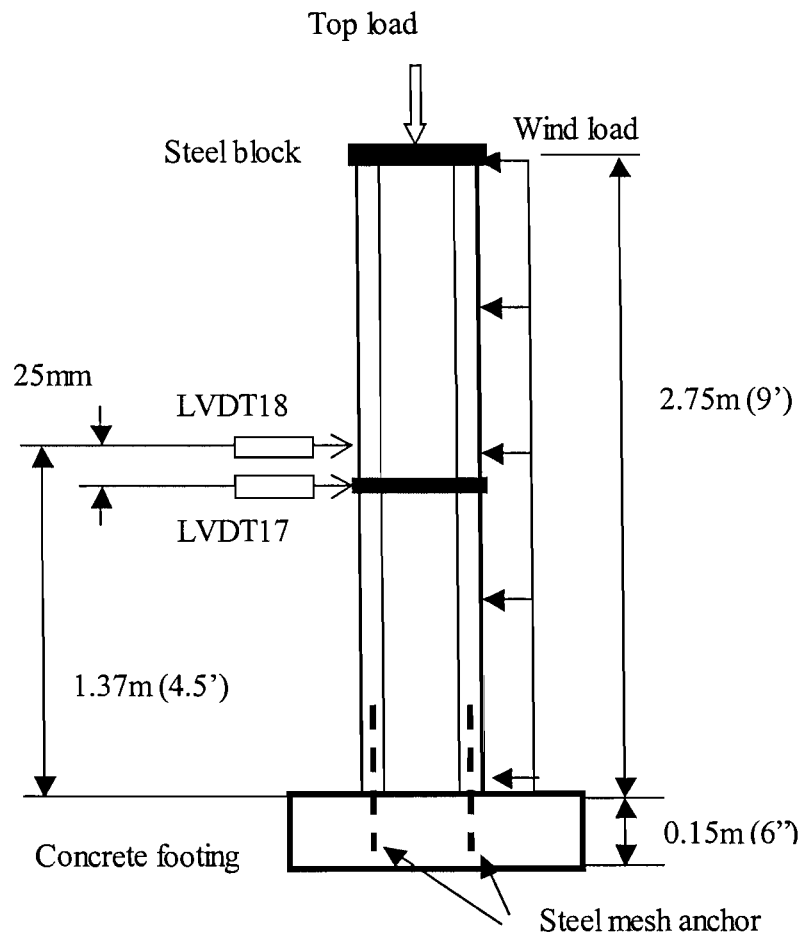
Side view of sandwich wall (wall thickness = 0.355m (14"))
